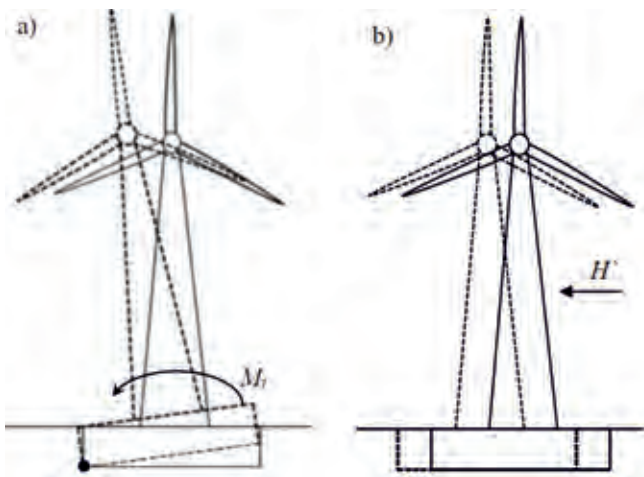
Failure of wind turbine a) overturning, b) sliding, M_t – total overturning moment H – horizontal force [2]
